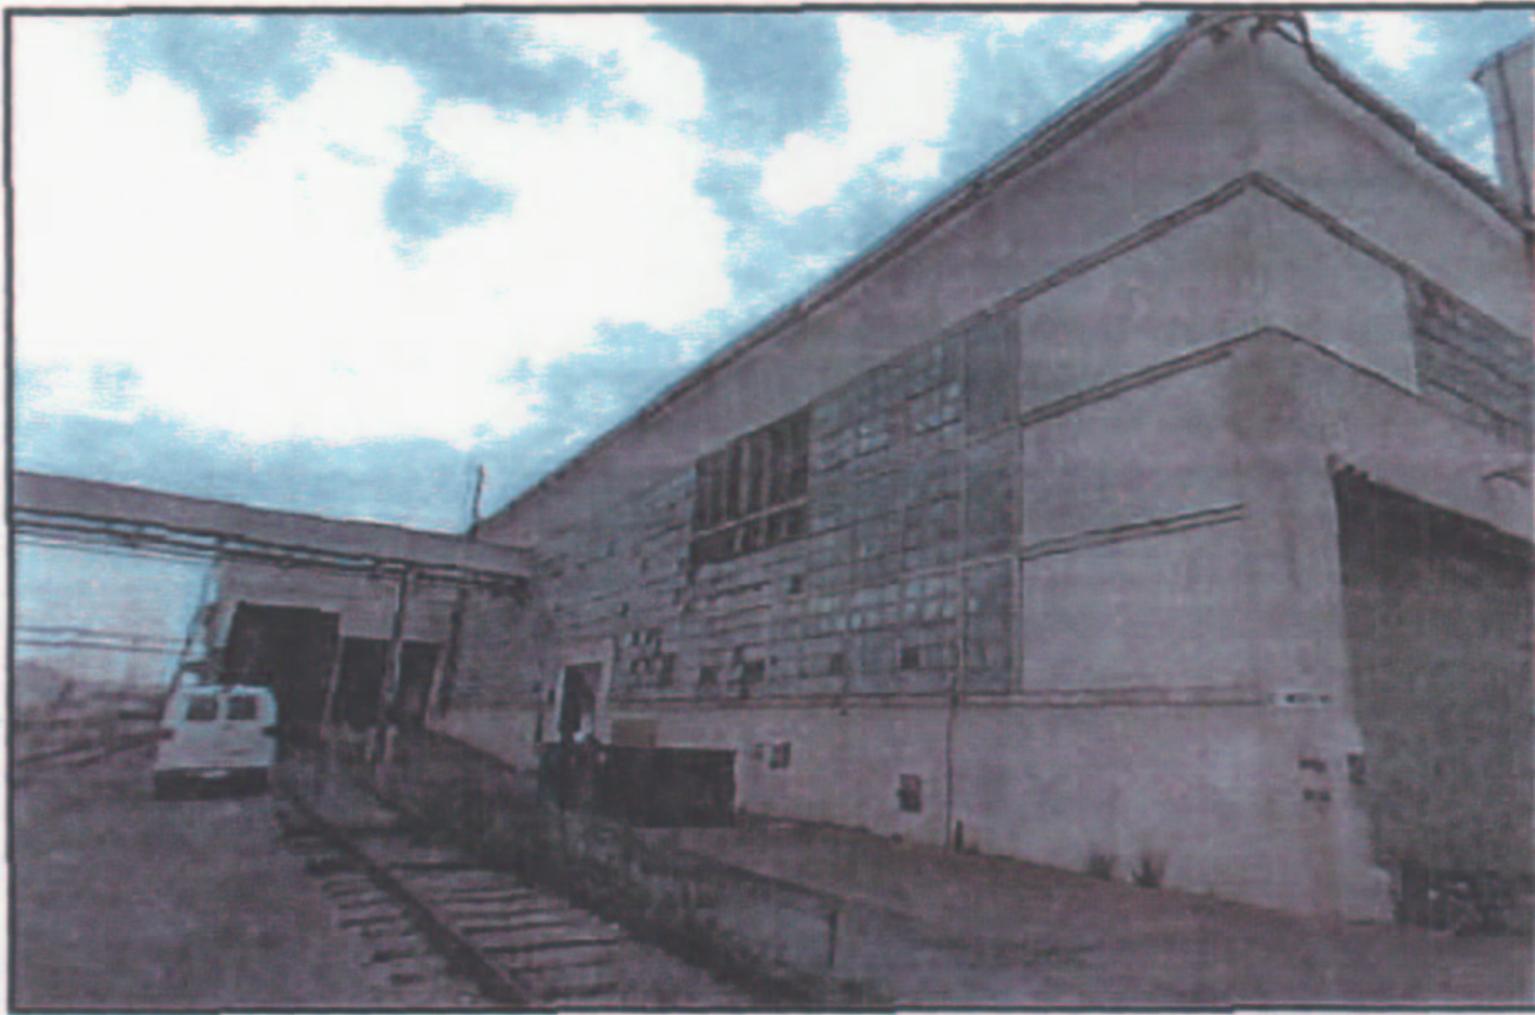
Original center section of Building C-410. This view is of the south facade towards the northwest. Visible at left is the loading dock and platform.
